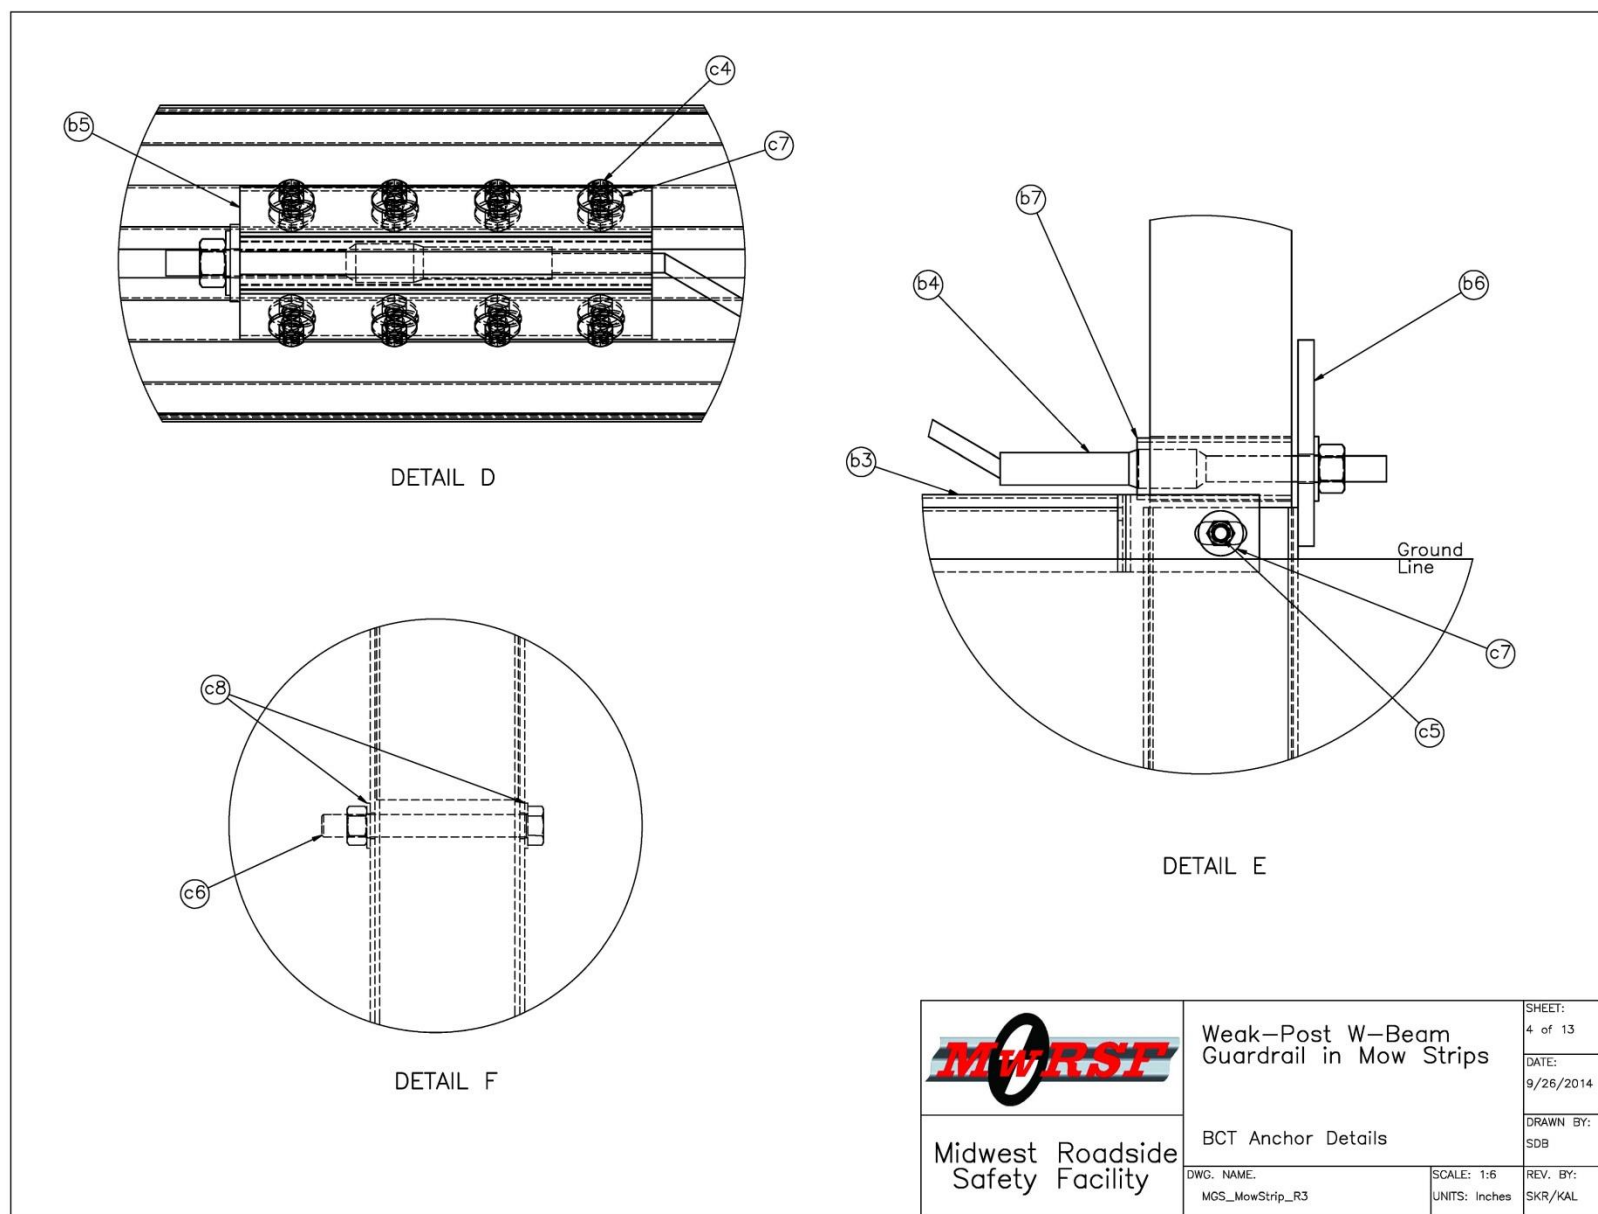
Anchorage Component Details, Test No. MGSMS-1
